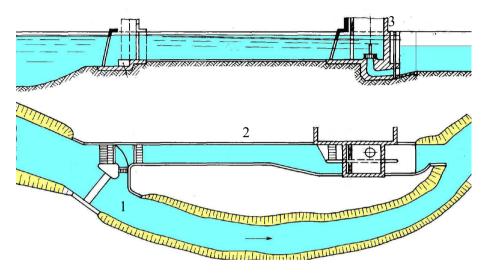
Hydropower station with canal derivation: 1-weir, 2 - canal, 3 - powerhouse
